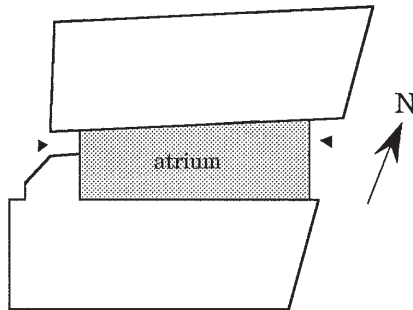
Plan of Scandinavian Center (Wall & Blomsterberg, 1994).
